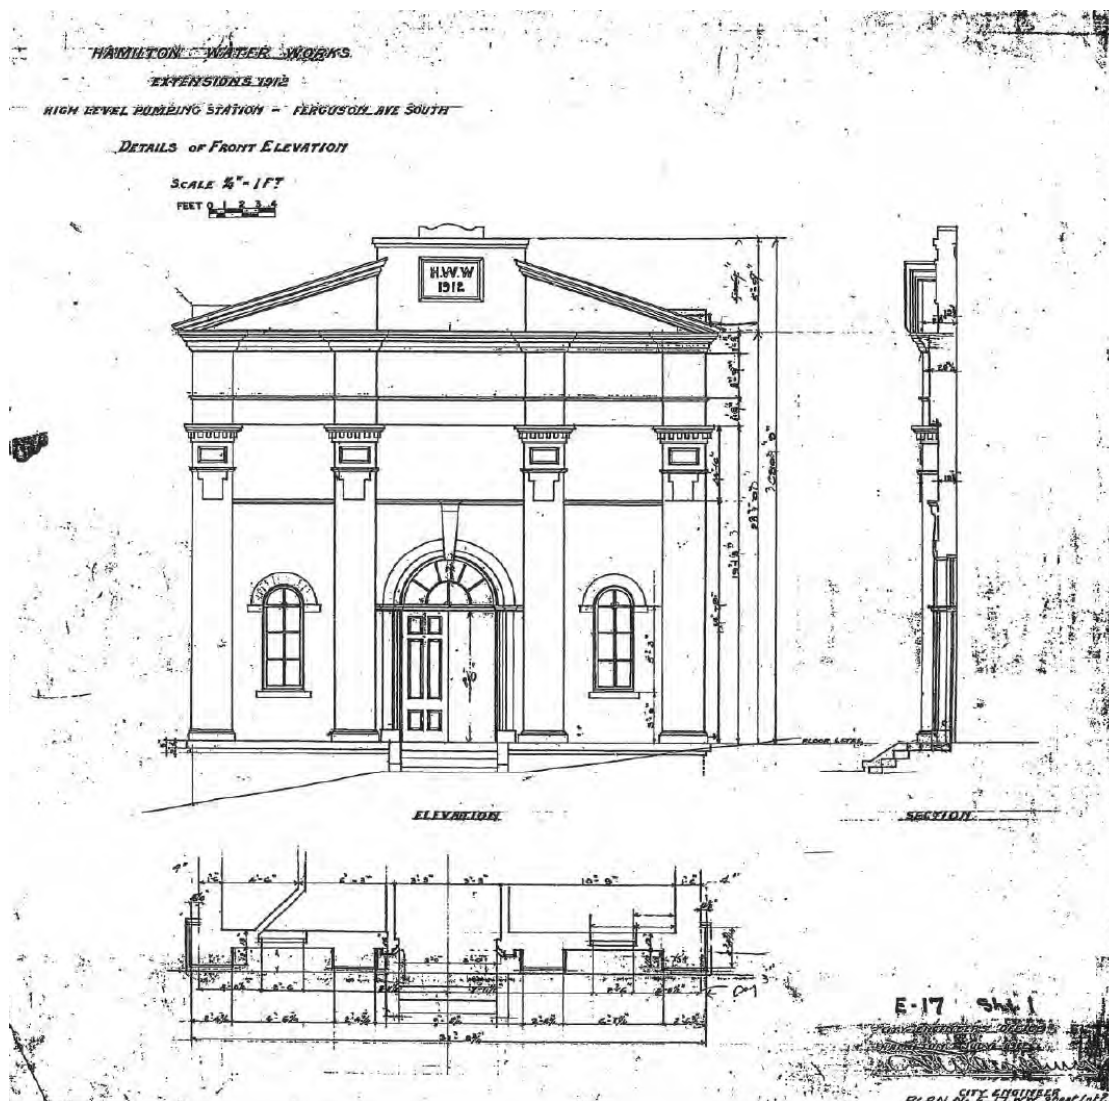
The west façade of the new station in elevation (top), plan (bottom), and section (right) (City of Hamilton 1913).
